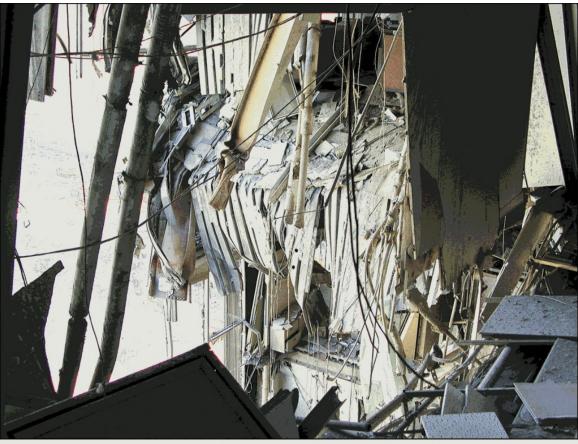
Area of collapsed floor slab in bays between C-8, E-8, C-7, and E-7, from the 15th floor.
